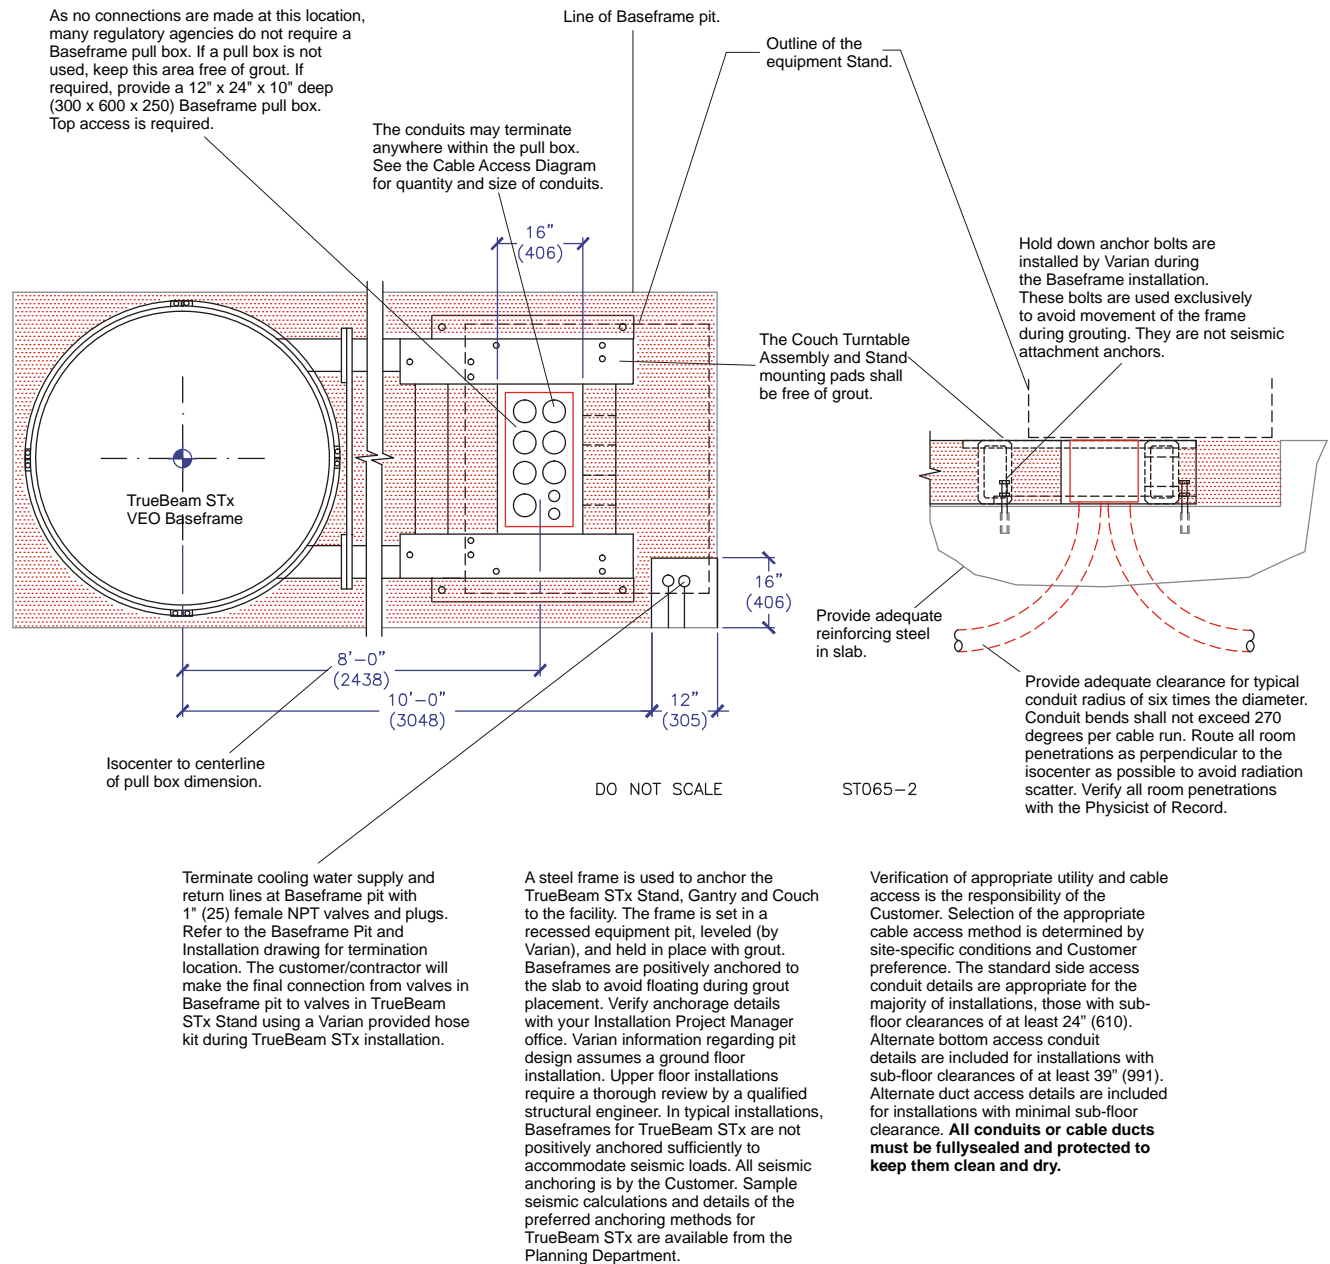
Alternate Bottom Cable Access Plan and Section at Pull Box
